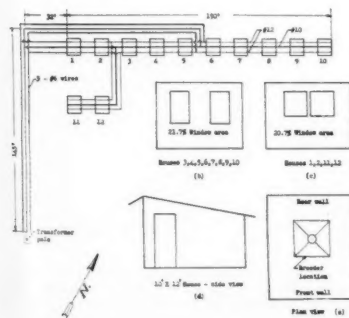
' (Extreme left) Dimensional arrangement (a) of colony brooder houses, location of transformer pole, and sizes of feed wires; front wall window spacing and per cent of window area, (b) and (c); side (d) and plan (e) view of houses, indicating locations of door and brooder, respectively. Fig. 3 (Left) The relation between voltage and connected load in watts for one of eight brooders operated is shown graphically here
